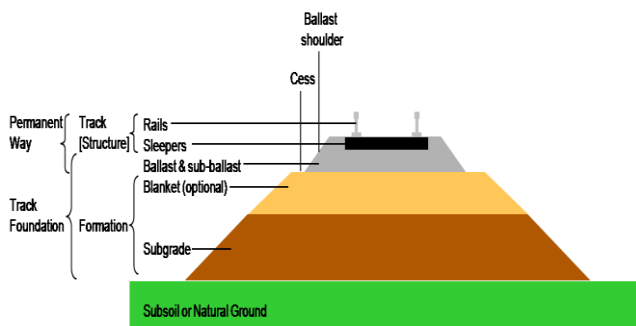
Typical Cross-section representing Formation Components ([http://en.wikipedia.org/wiki/Track\\_bed](http://en.wikipedia.org/wiki/Track_bed)). A few commonly used terms used in railways are mentioned through Fig.1.
